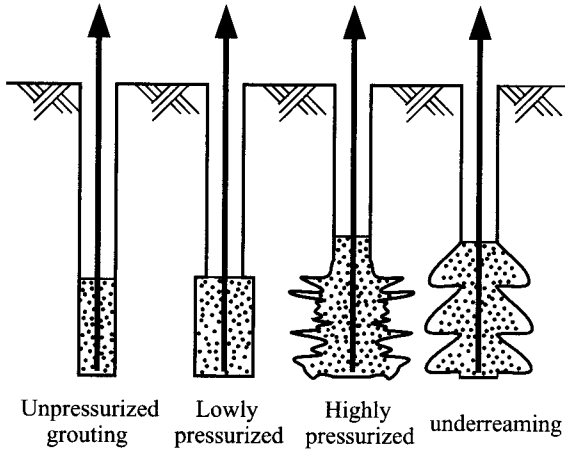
Construction of anchorage bodies: (a) direct grouting (without grouting pressure), (b) low grouting pressure, (c) high grouting pressure, and (d) underreaming (redrawn after CICHE, 1998).
